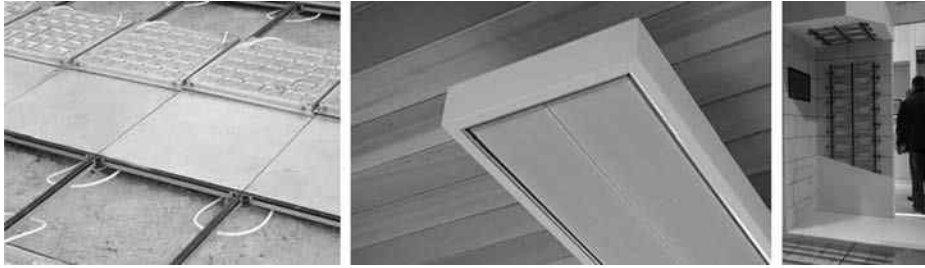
Floor-mounted, ceiling-mounted, and wall-mounted radiant panels.
